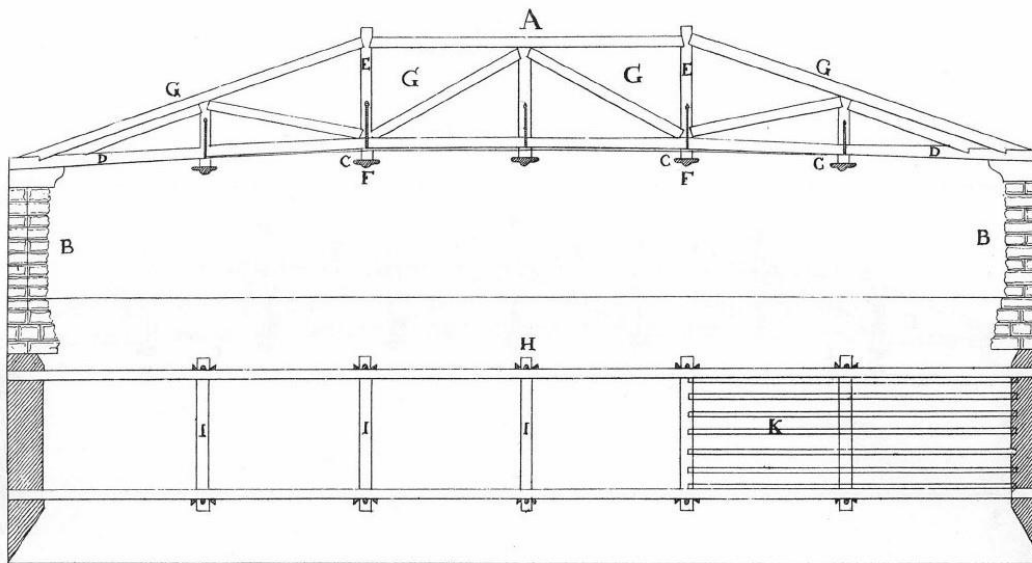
Elevation (top) and plan (bottom) views of Palladio's Cismone truss bridge
